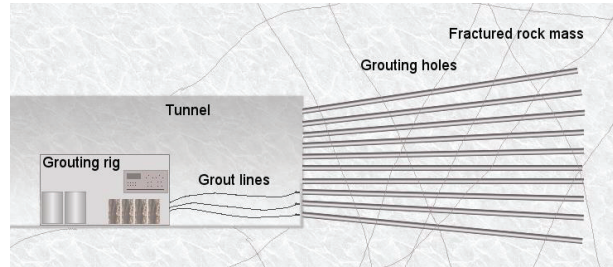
Illustration of pre-grouting performed in a tunnel during excavation.
